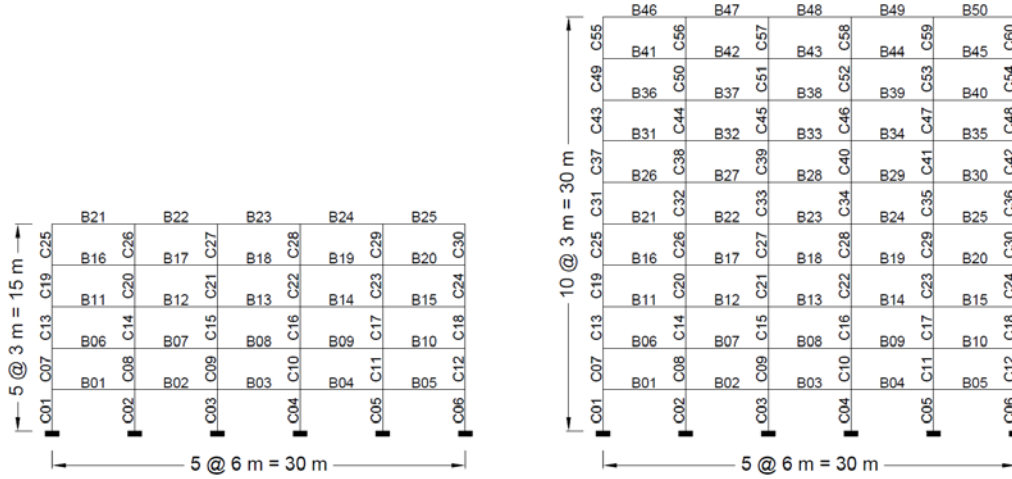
Mathematical models for 5-bay moment-resisting steel frames with 5 and 10 storeys
